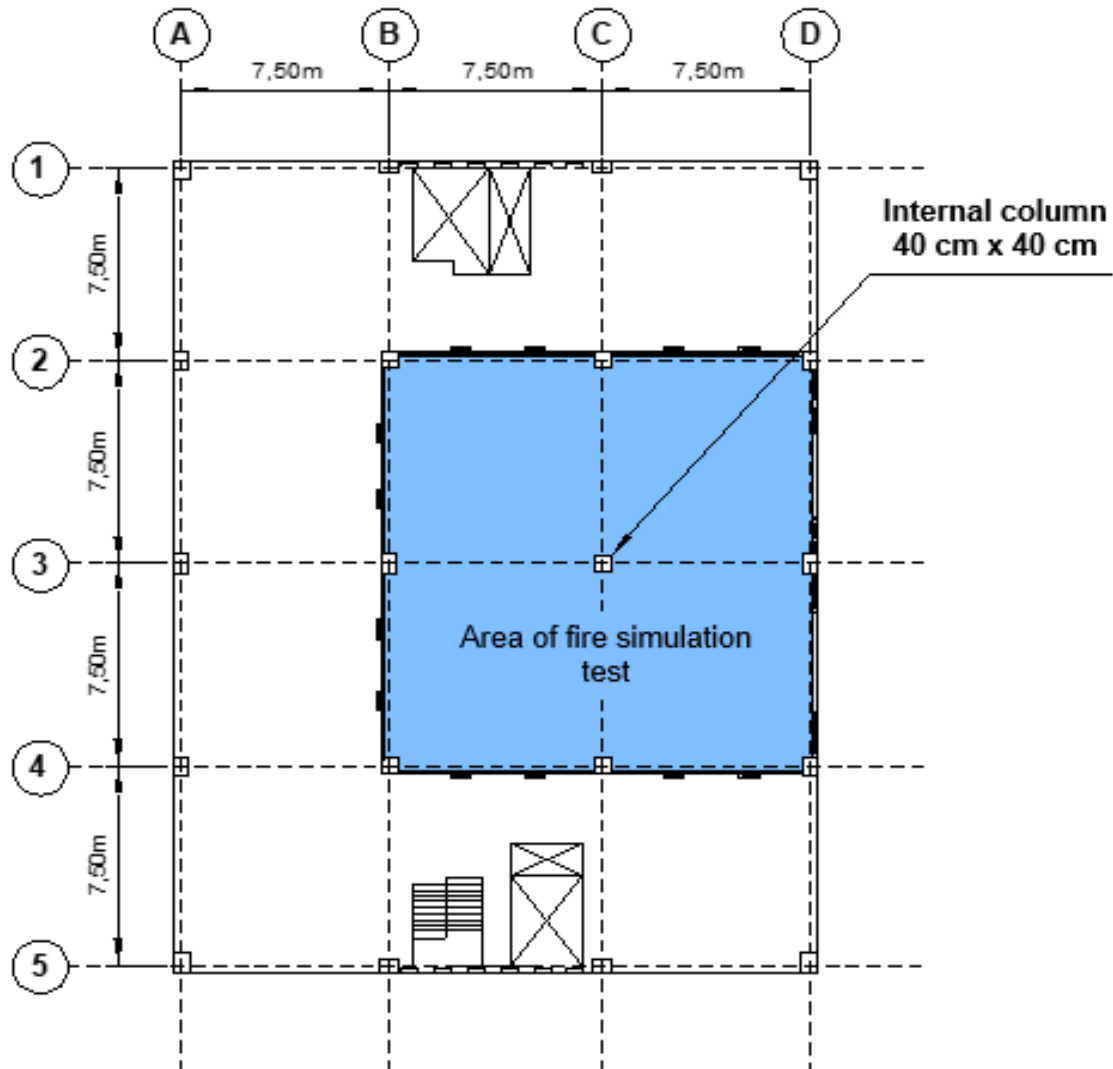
Plan of the prototype structure in reinforced concrete indicating the area under fire simulation (Chana & Price, 2003).
